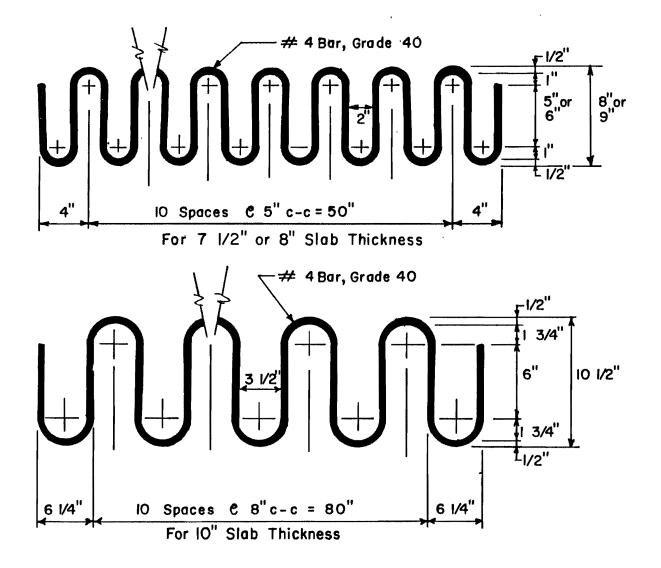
Configurations of the #4 Stirrups Used in the Modified T202 and T5 Bridge Railings.
